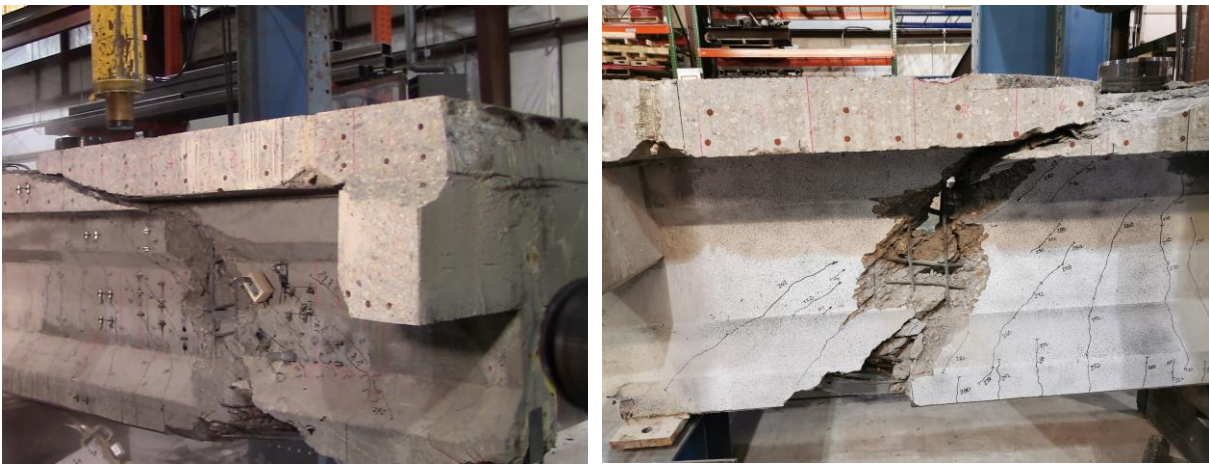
Shear Failure in Test-2 on I-Beam 9
